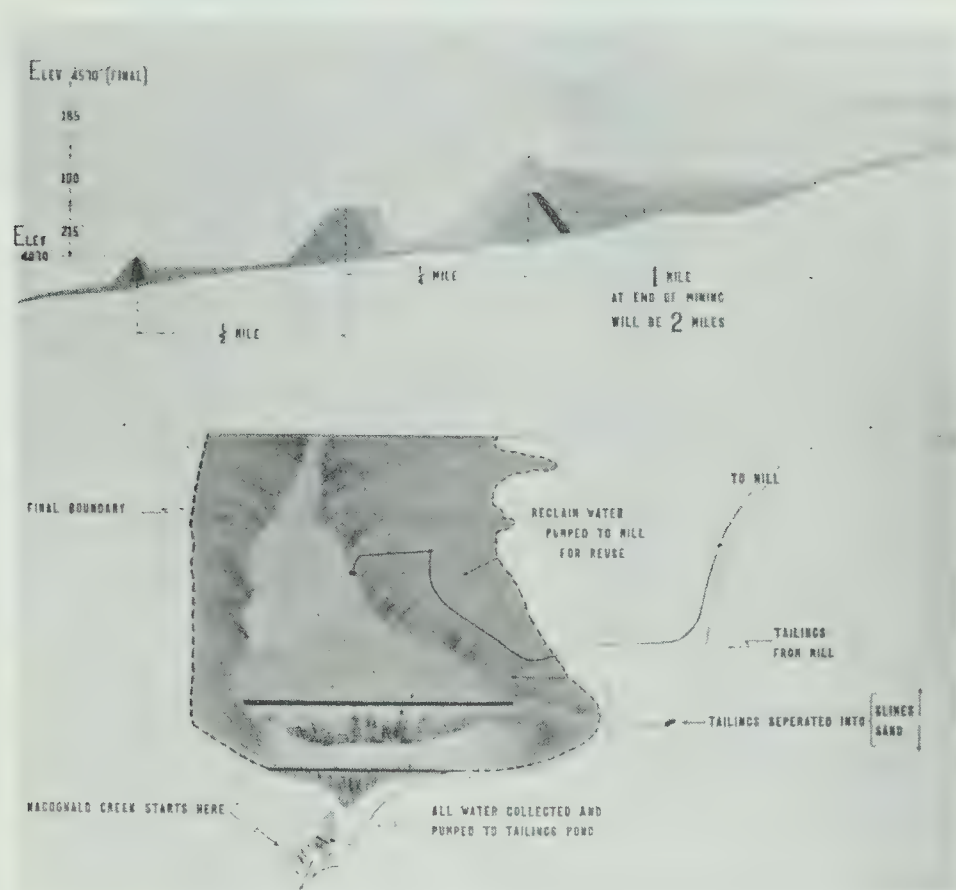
Tailings Disposal Concept at Brenda Mines
